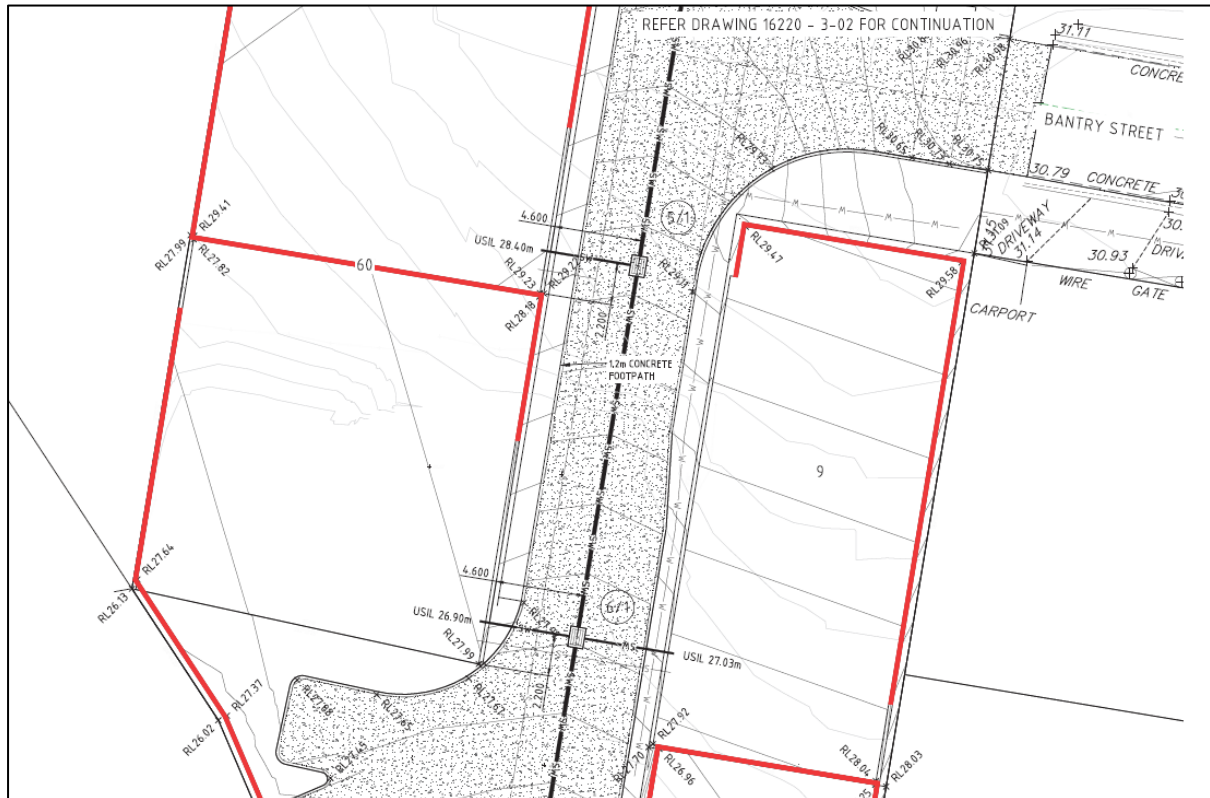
Stamped approved Site Grading & Drainage Plan (OW/405/2017)
